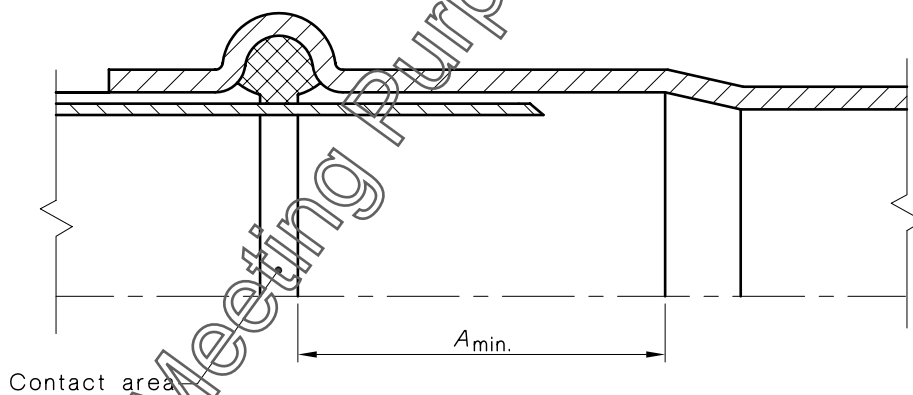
ELASTOMERIC SEAL JOINT WITH GROOVE IN SOCKET (½ SECTION)
